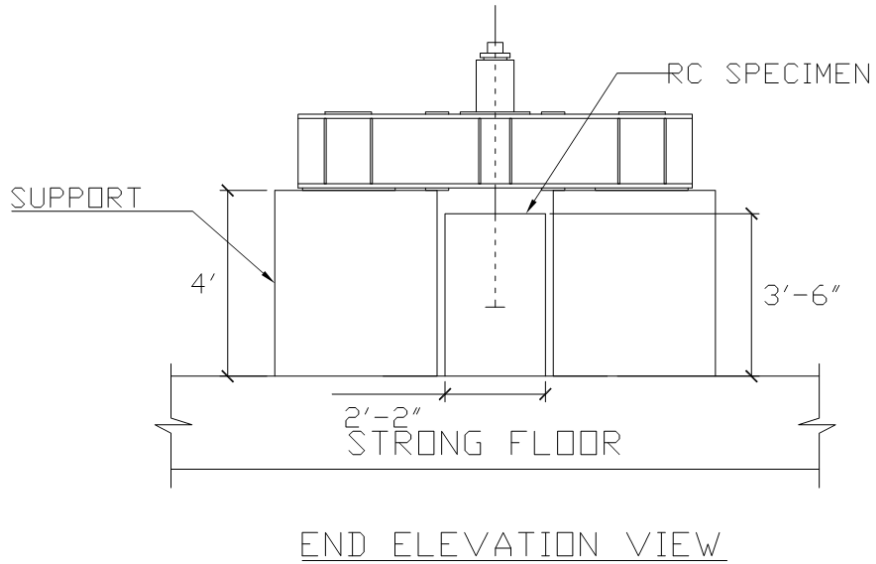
End elevation view of test setup for specimens with one No. 14 headed bar
